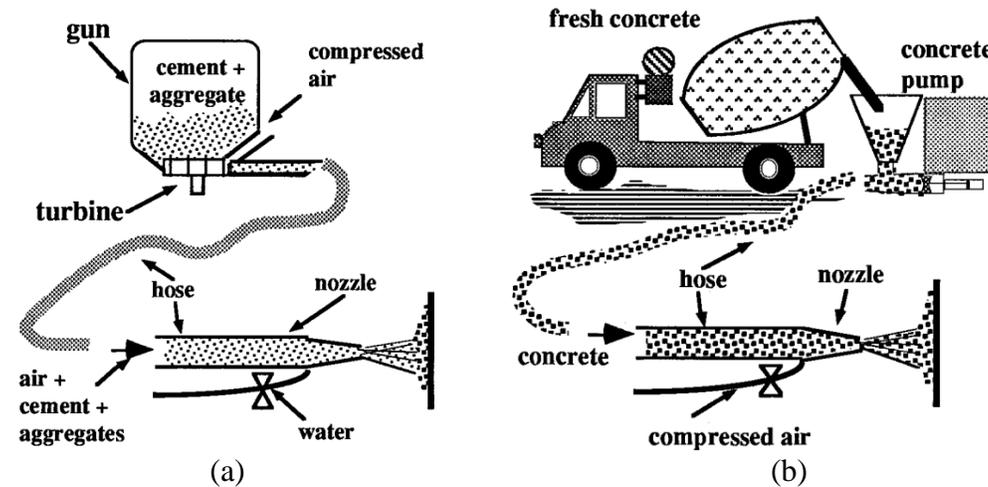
Schematic of shotcrete production: (a) Dry-mix process; and (b) Wet-mix
